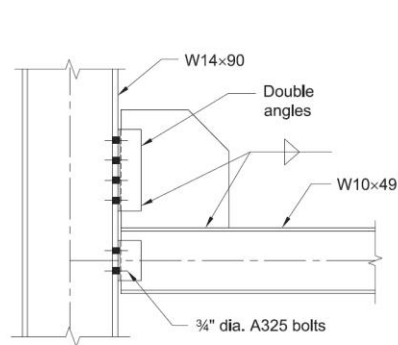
Beam-to-column connection that allows rotation (Stokes and Fahnestock, 2010).
